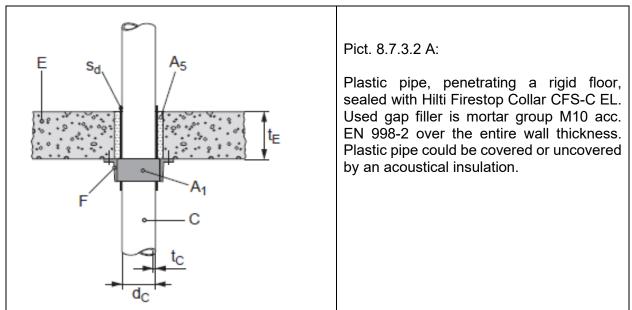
Gap seal with mortar/concrete around a plastic pipe, penetrating a floor
